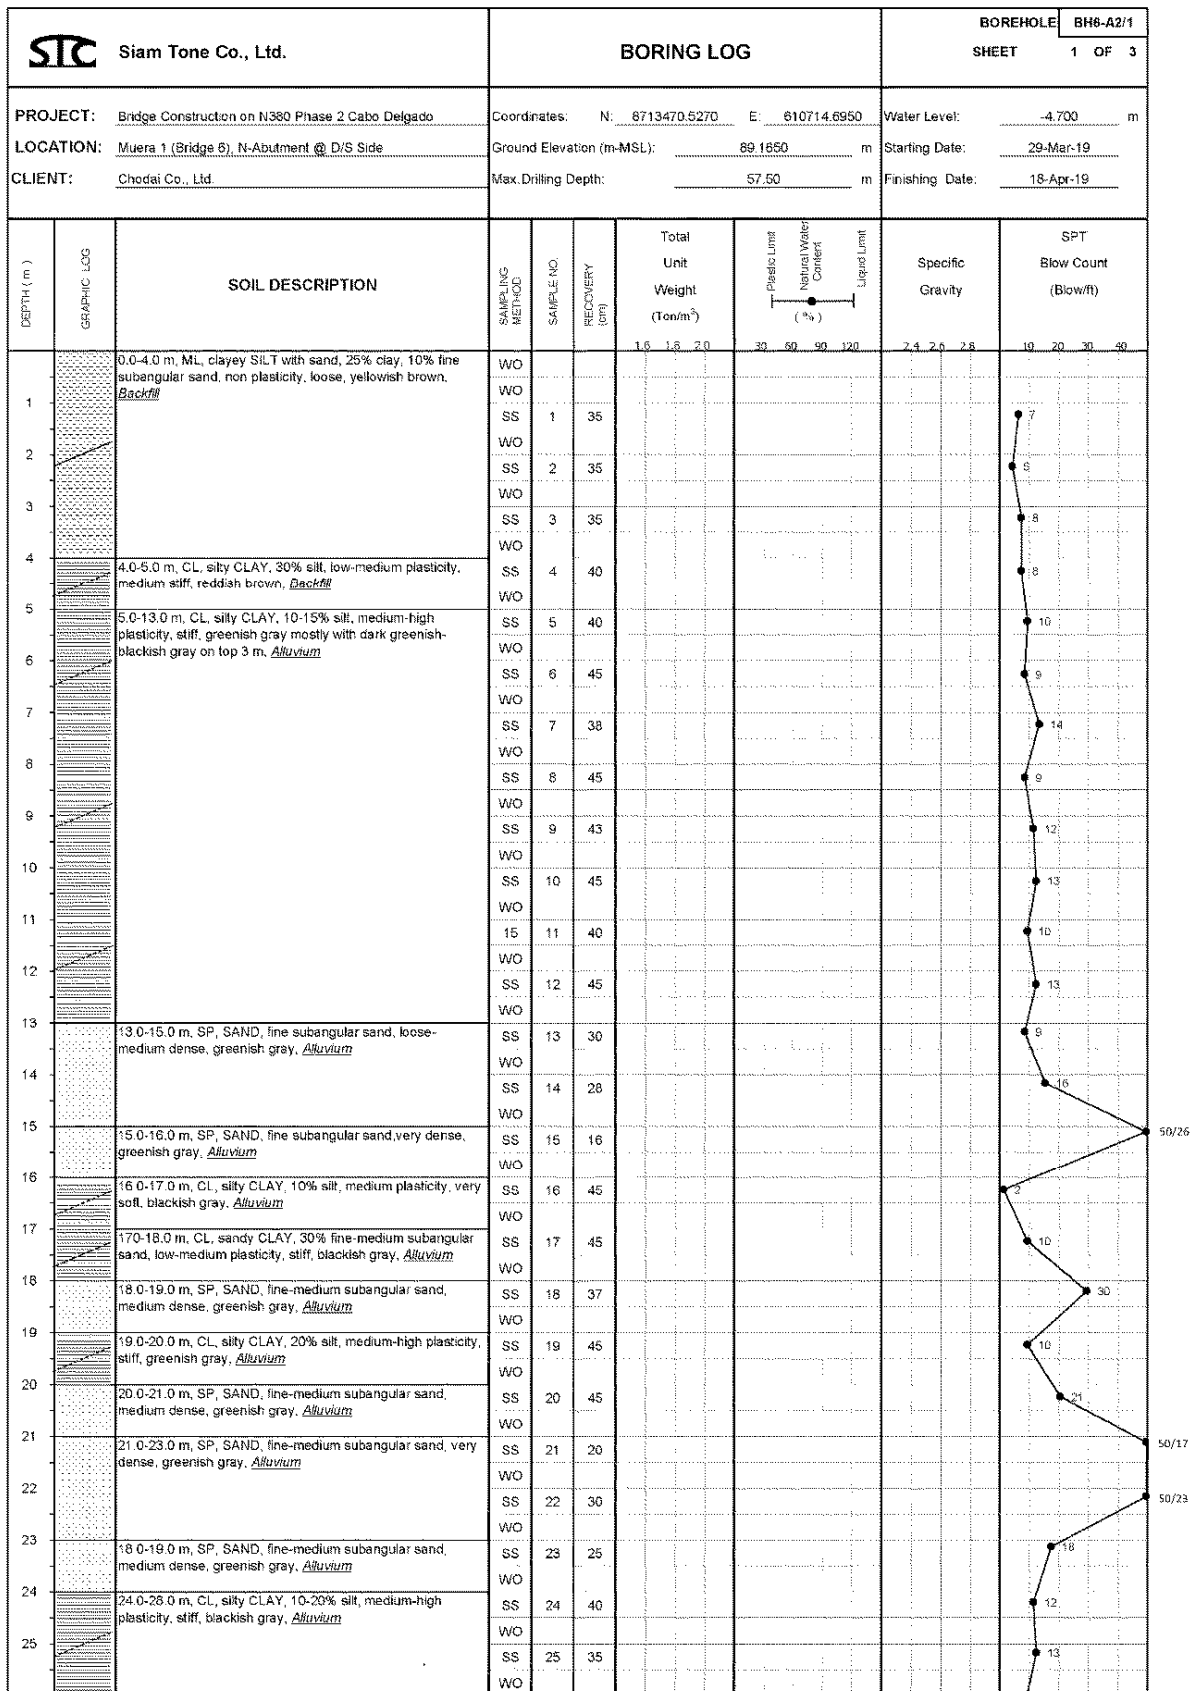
BH6-A2/1 at N-Abutment D/S Side of Muera I Bridge (B6)
